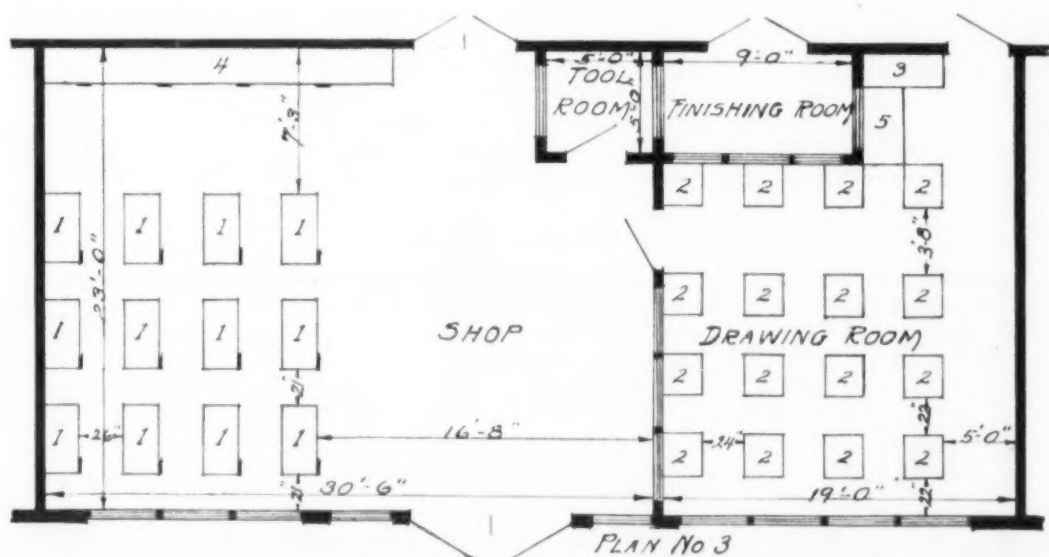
Suggestive Plan for Small General Shop for Carpentry, Cabinet Work, Farm Repair Work and Mechanical Drawing for Classes of 16 Pupils. Layout for Minimum Space and Equipment. Prepared by the Minnesota State Department of Education. Total Floor Area 1,150 Square Feet.
